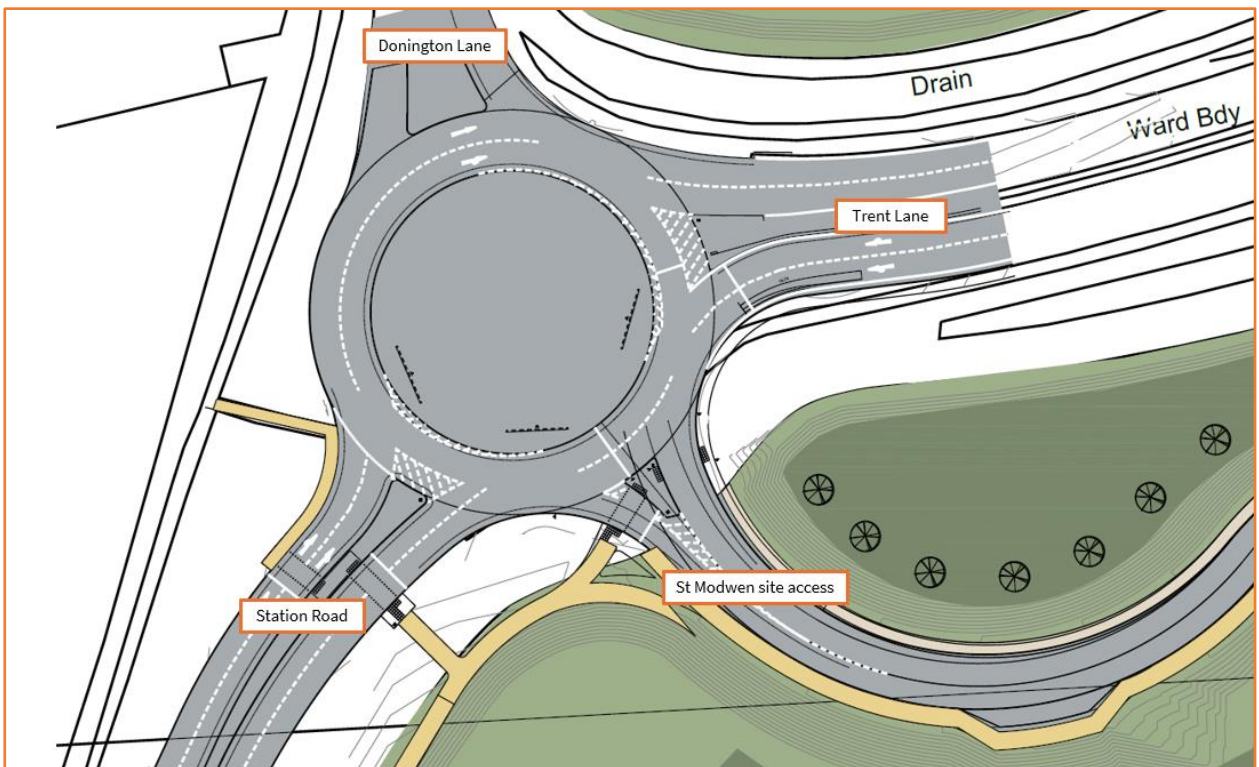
Station Road/Donington Lane/Trent Lane/St Modwen site access
